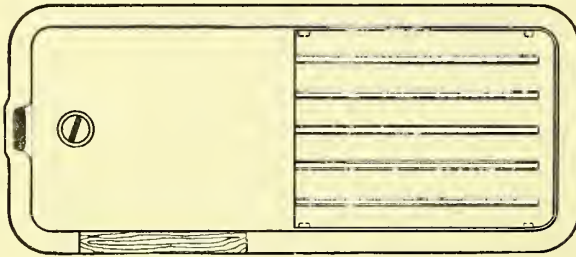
Sink with Plug Outlet, Lugs for Draining Board, and High Skirting
